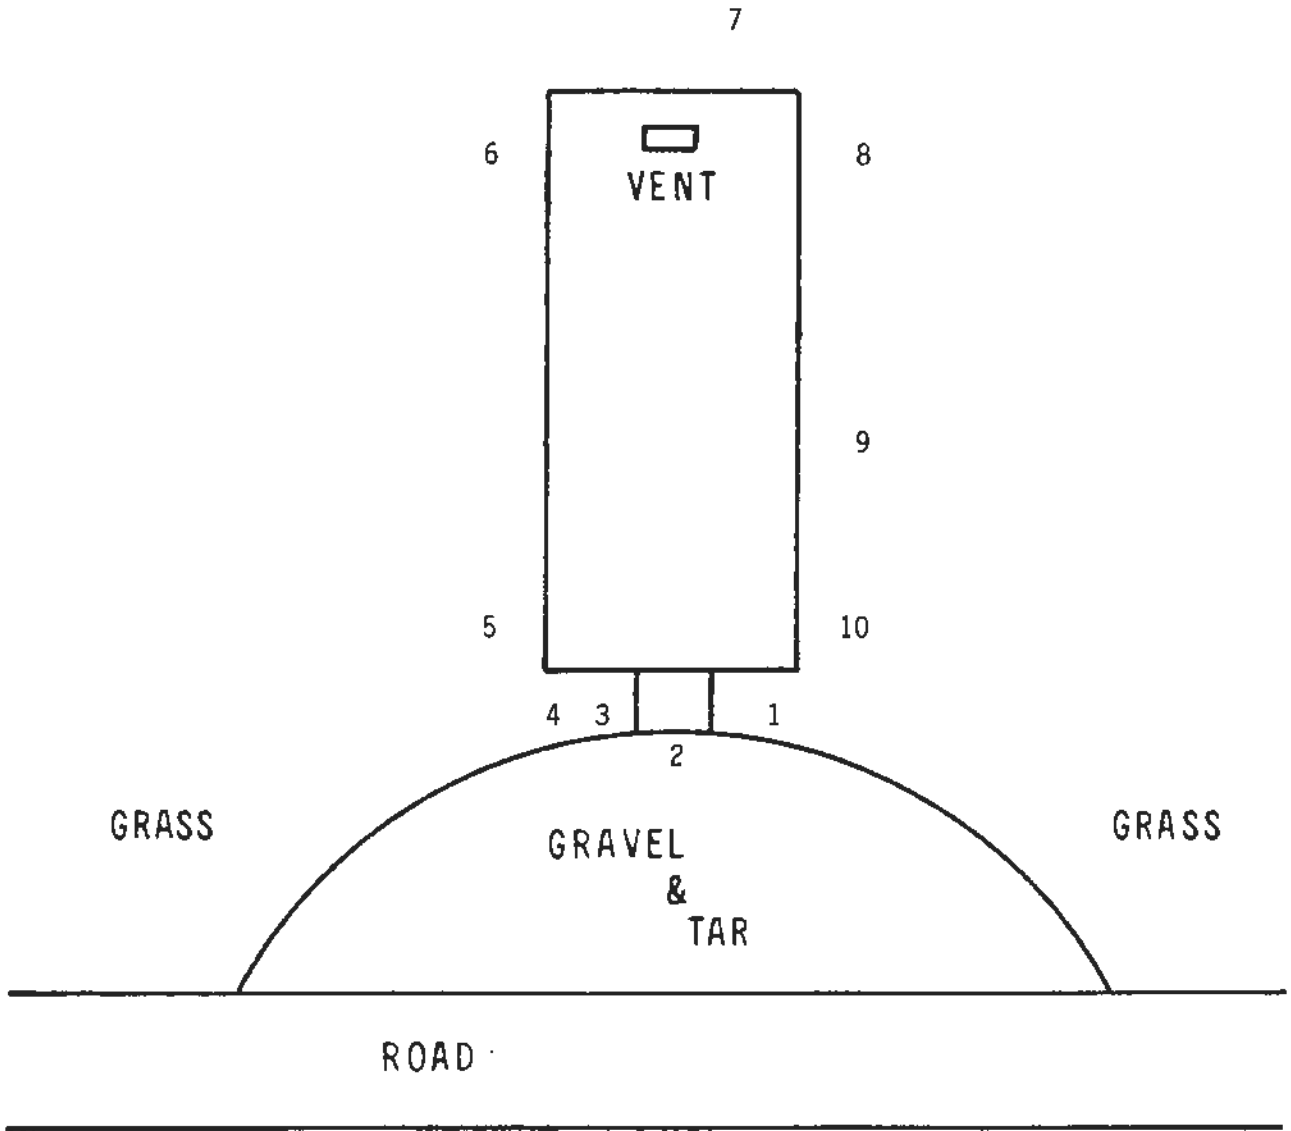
Second Team Surveyed Positions: Building 805 (Exterior)
